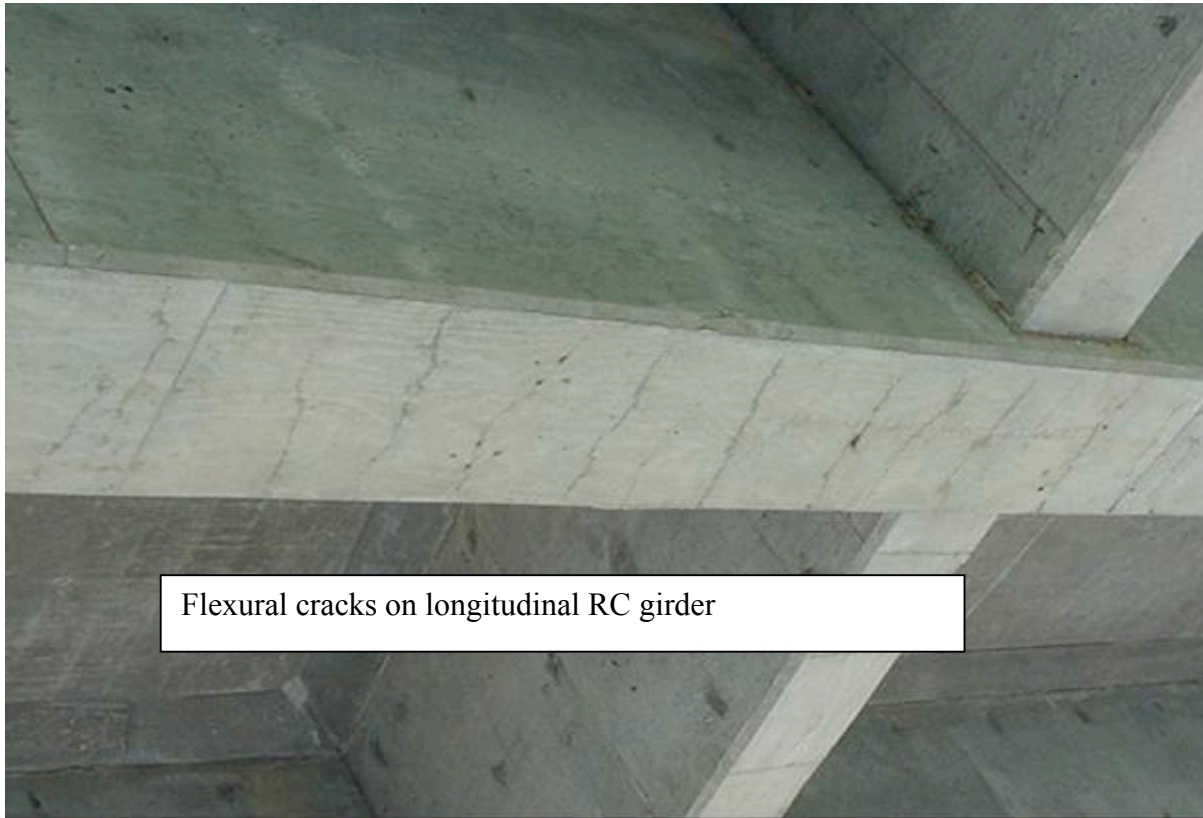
Flexural cracks on the longitudinal reinforced concrete girders in the Louisa-fort Gay bridge
